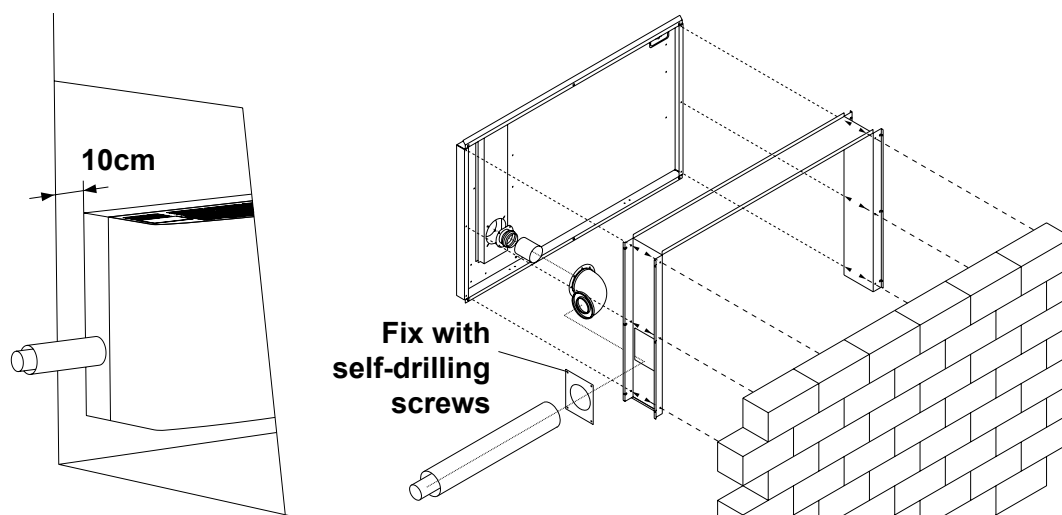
Example of side wall installation with coaxial Air/Fume kit
